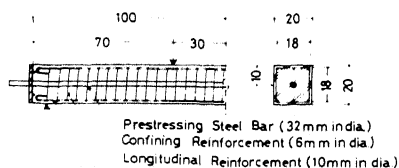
Scheme of column specimen and loading condition (Unit : cm)
